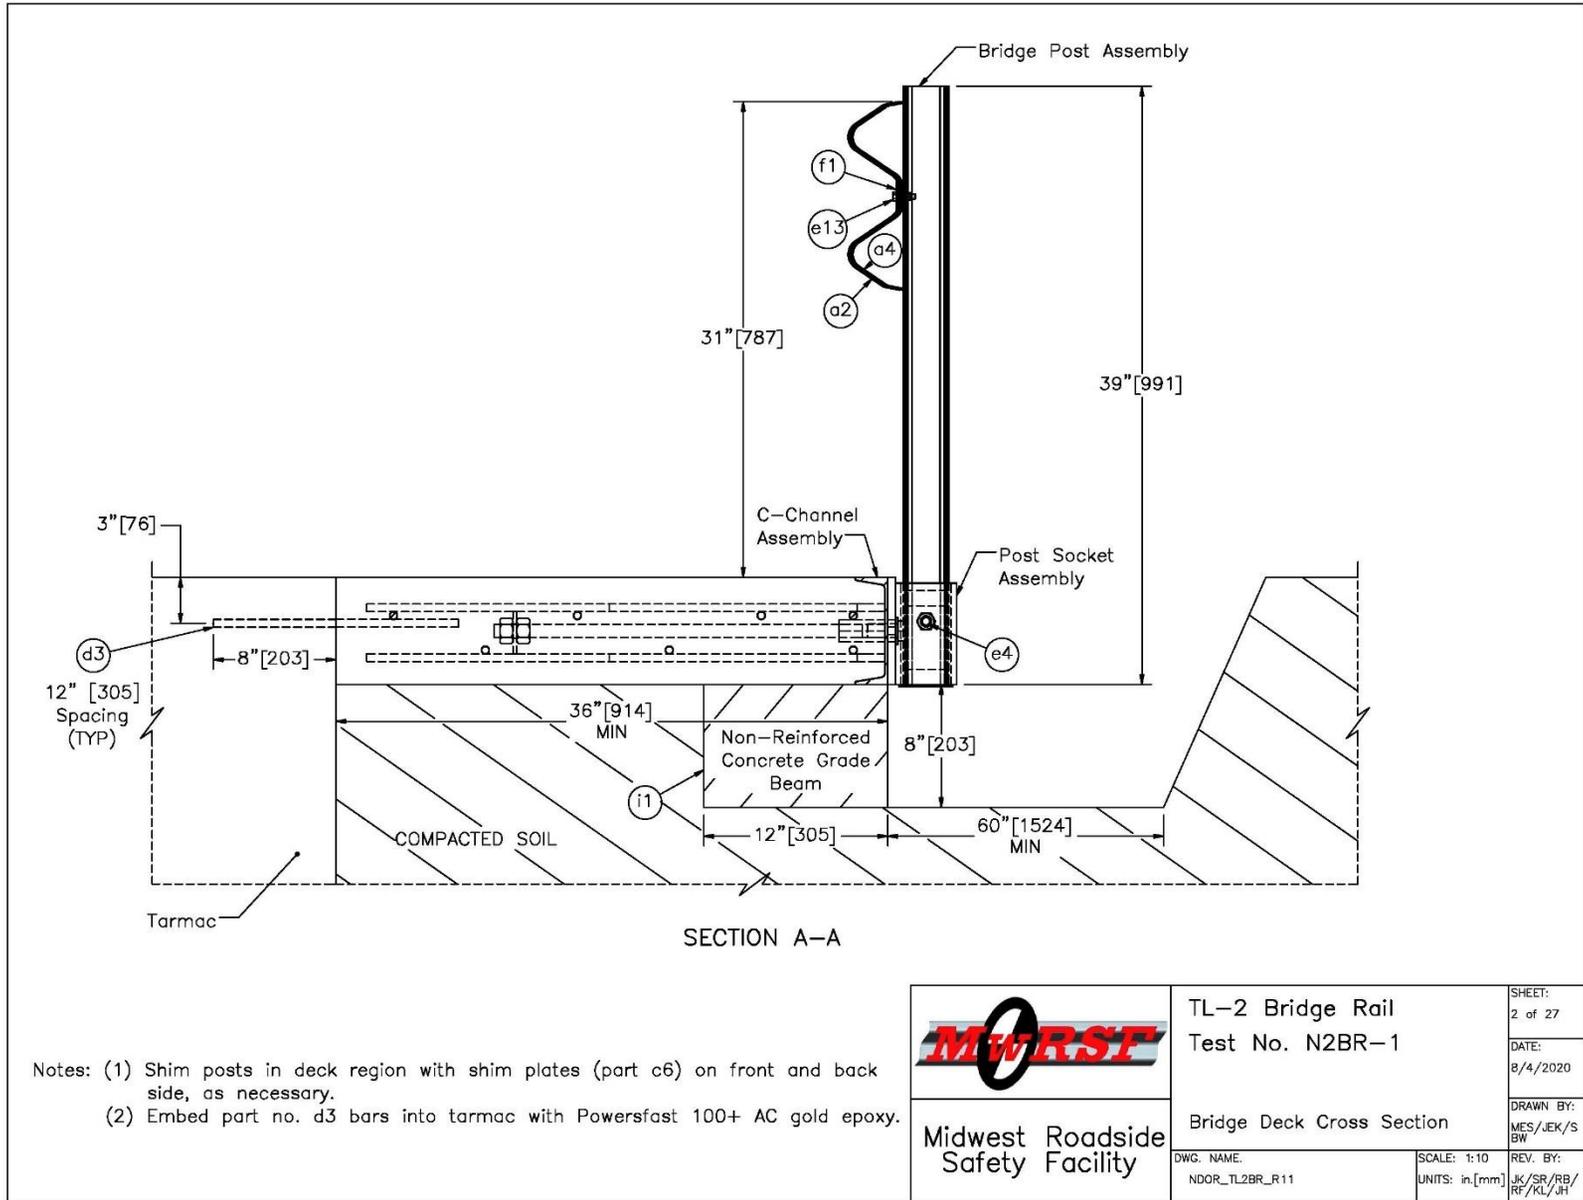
Bridge Deck Cross Section, Test No. N2BR-1
